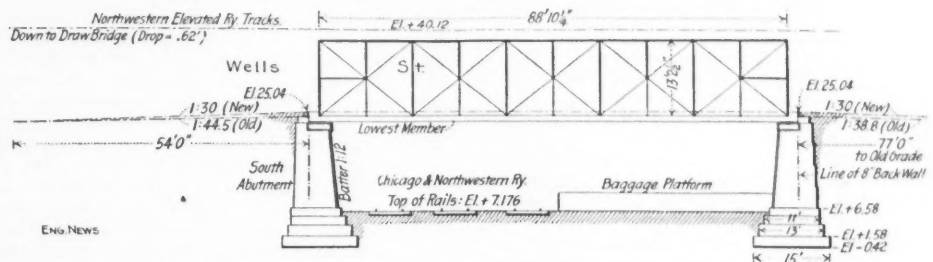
DIAGRAM ELEVATION OF DOUBLE-DECK BRIDGE AT WELLS ST., CHICAGO.
